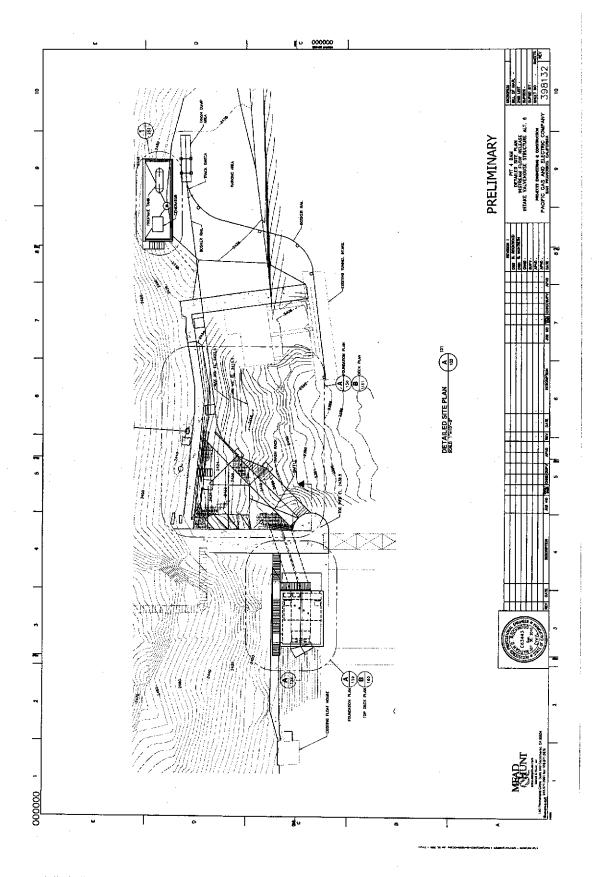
Location and configuration of new instream flow release structure at Pit 4 Dam
